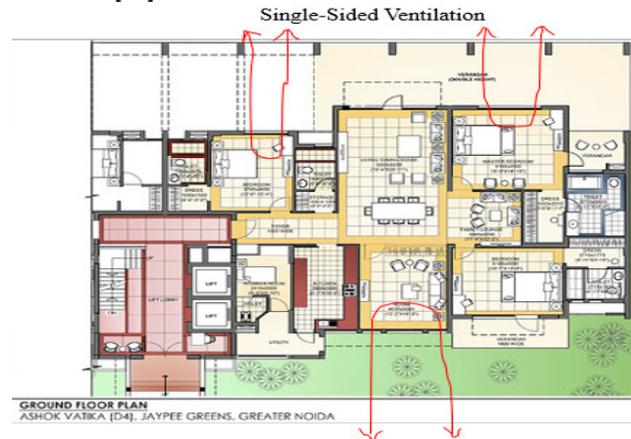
Floor plan of 4BHK Apartment – Jaypee Greens (Source: Authors' Sketch, 2020).
